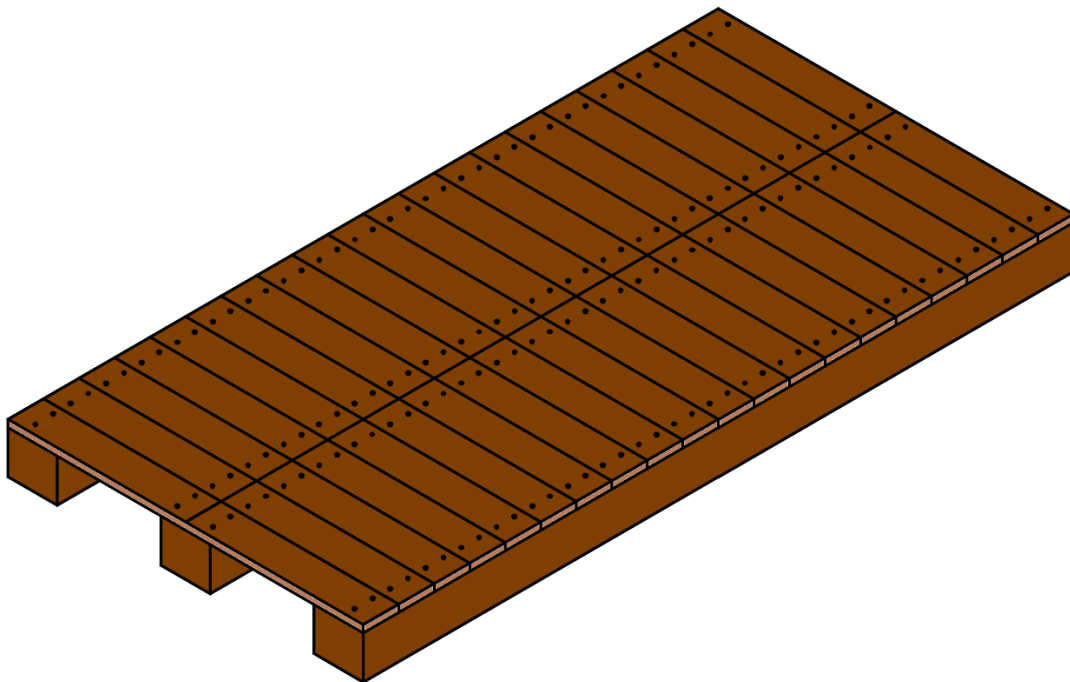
Common timber floor layout used in unreinforced masonry buildings.
